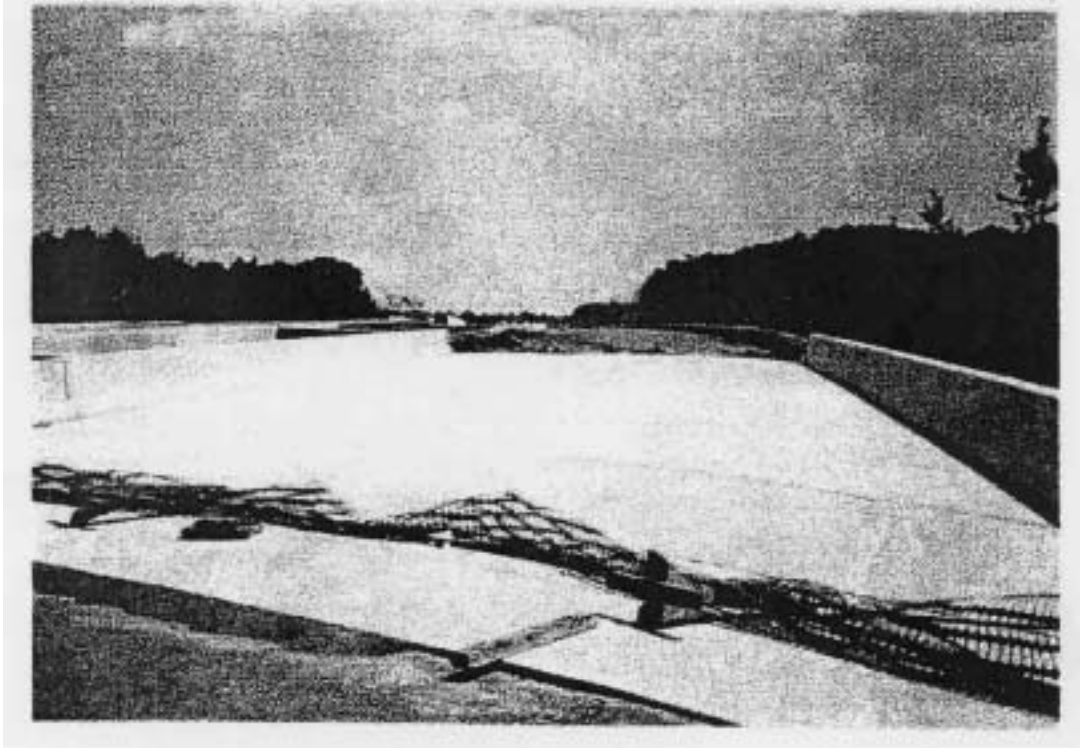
Bridge Deck over Wyckoff Road Eastbound near Completion
